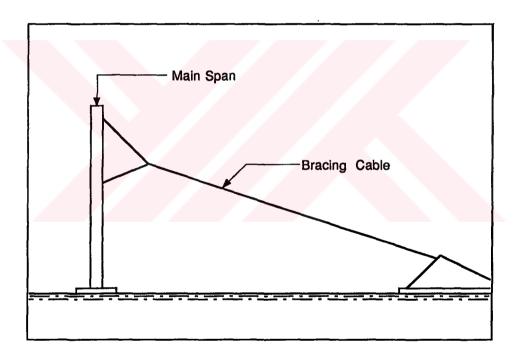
PROPOSED ARRANGEMENT BRACING CABLES OF THE GREAT BELT BRIDGE PROJECT
